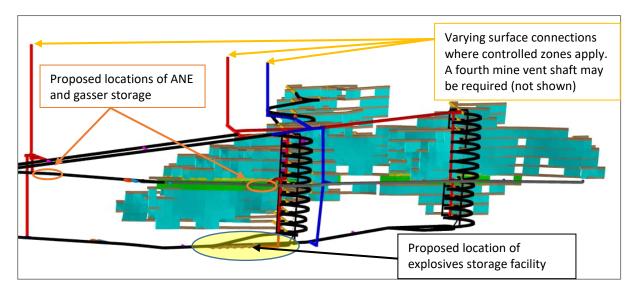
Underground mine layout showing the key hazardous substance storage locations. Section looks west.
